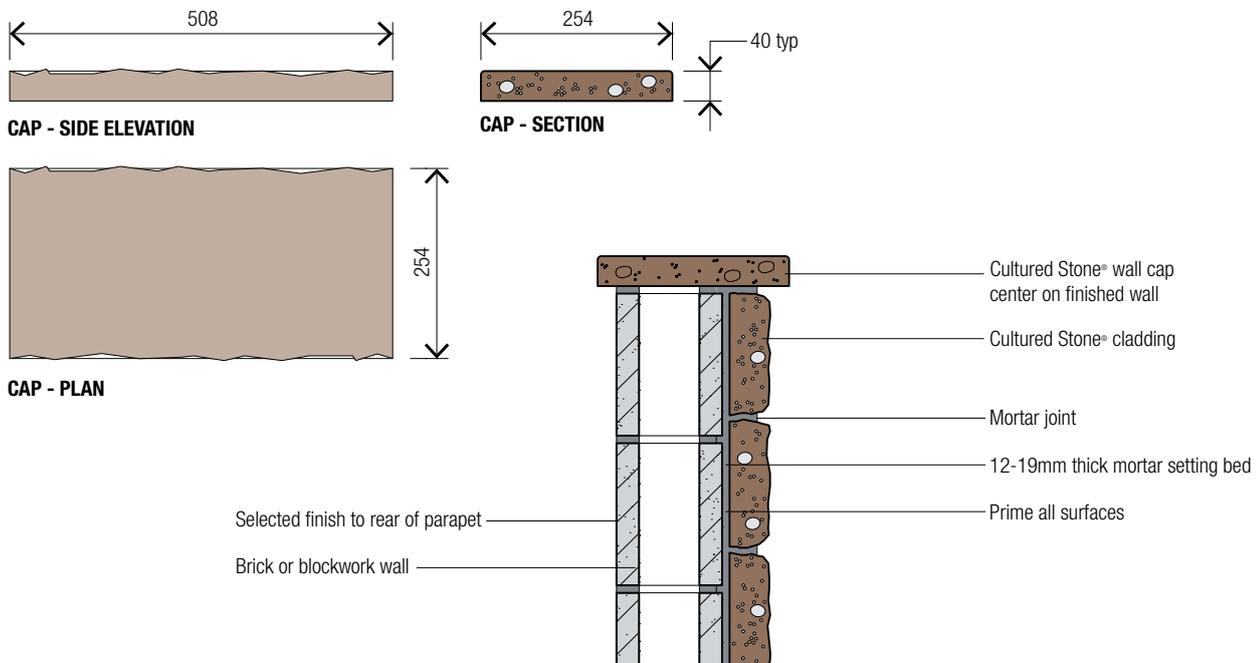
Brick or Block Work Parapet - Section (Dwg # CS-11.02)
